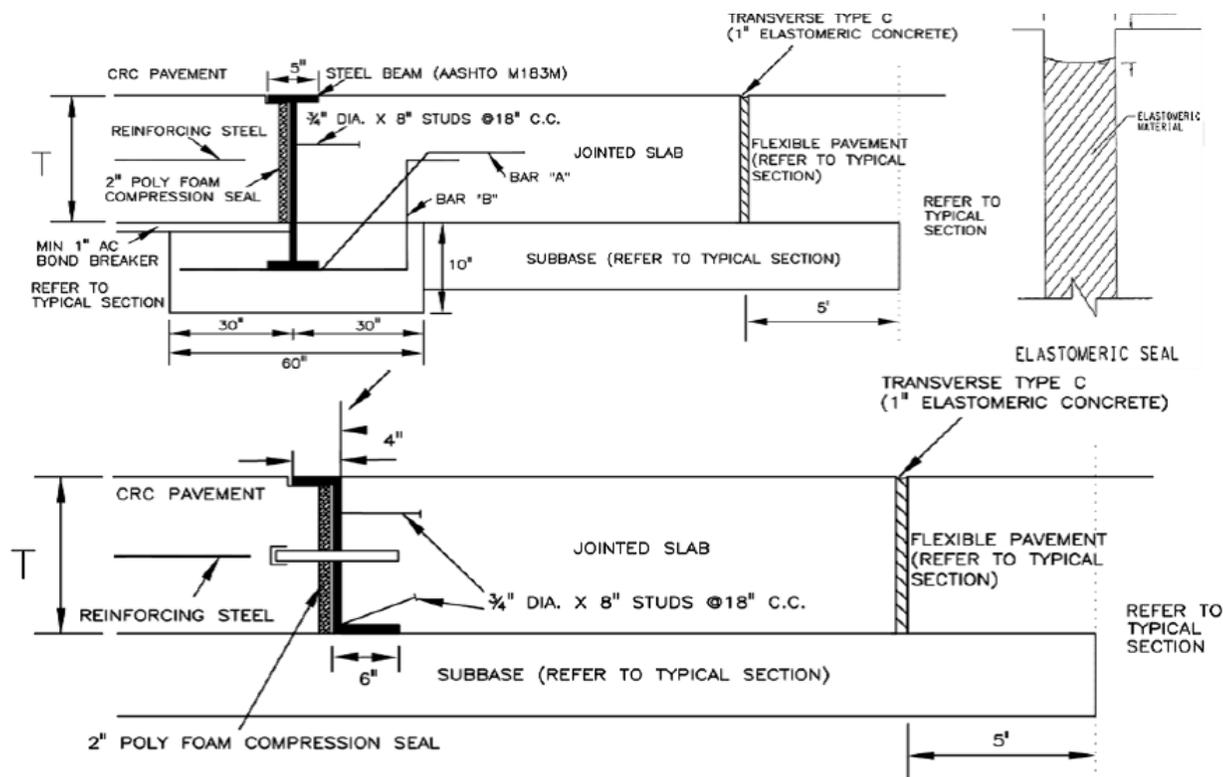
Transition between CRC and AC pavements using elastomeric concrete and a JC pavement slab segment.
